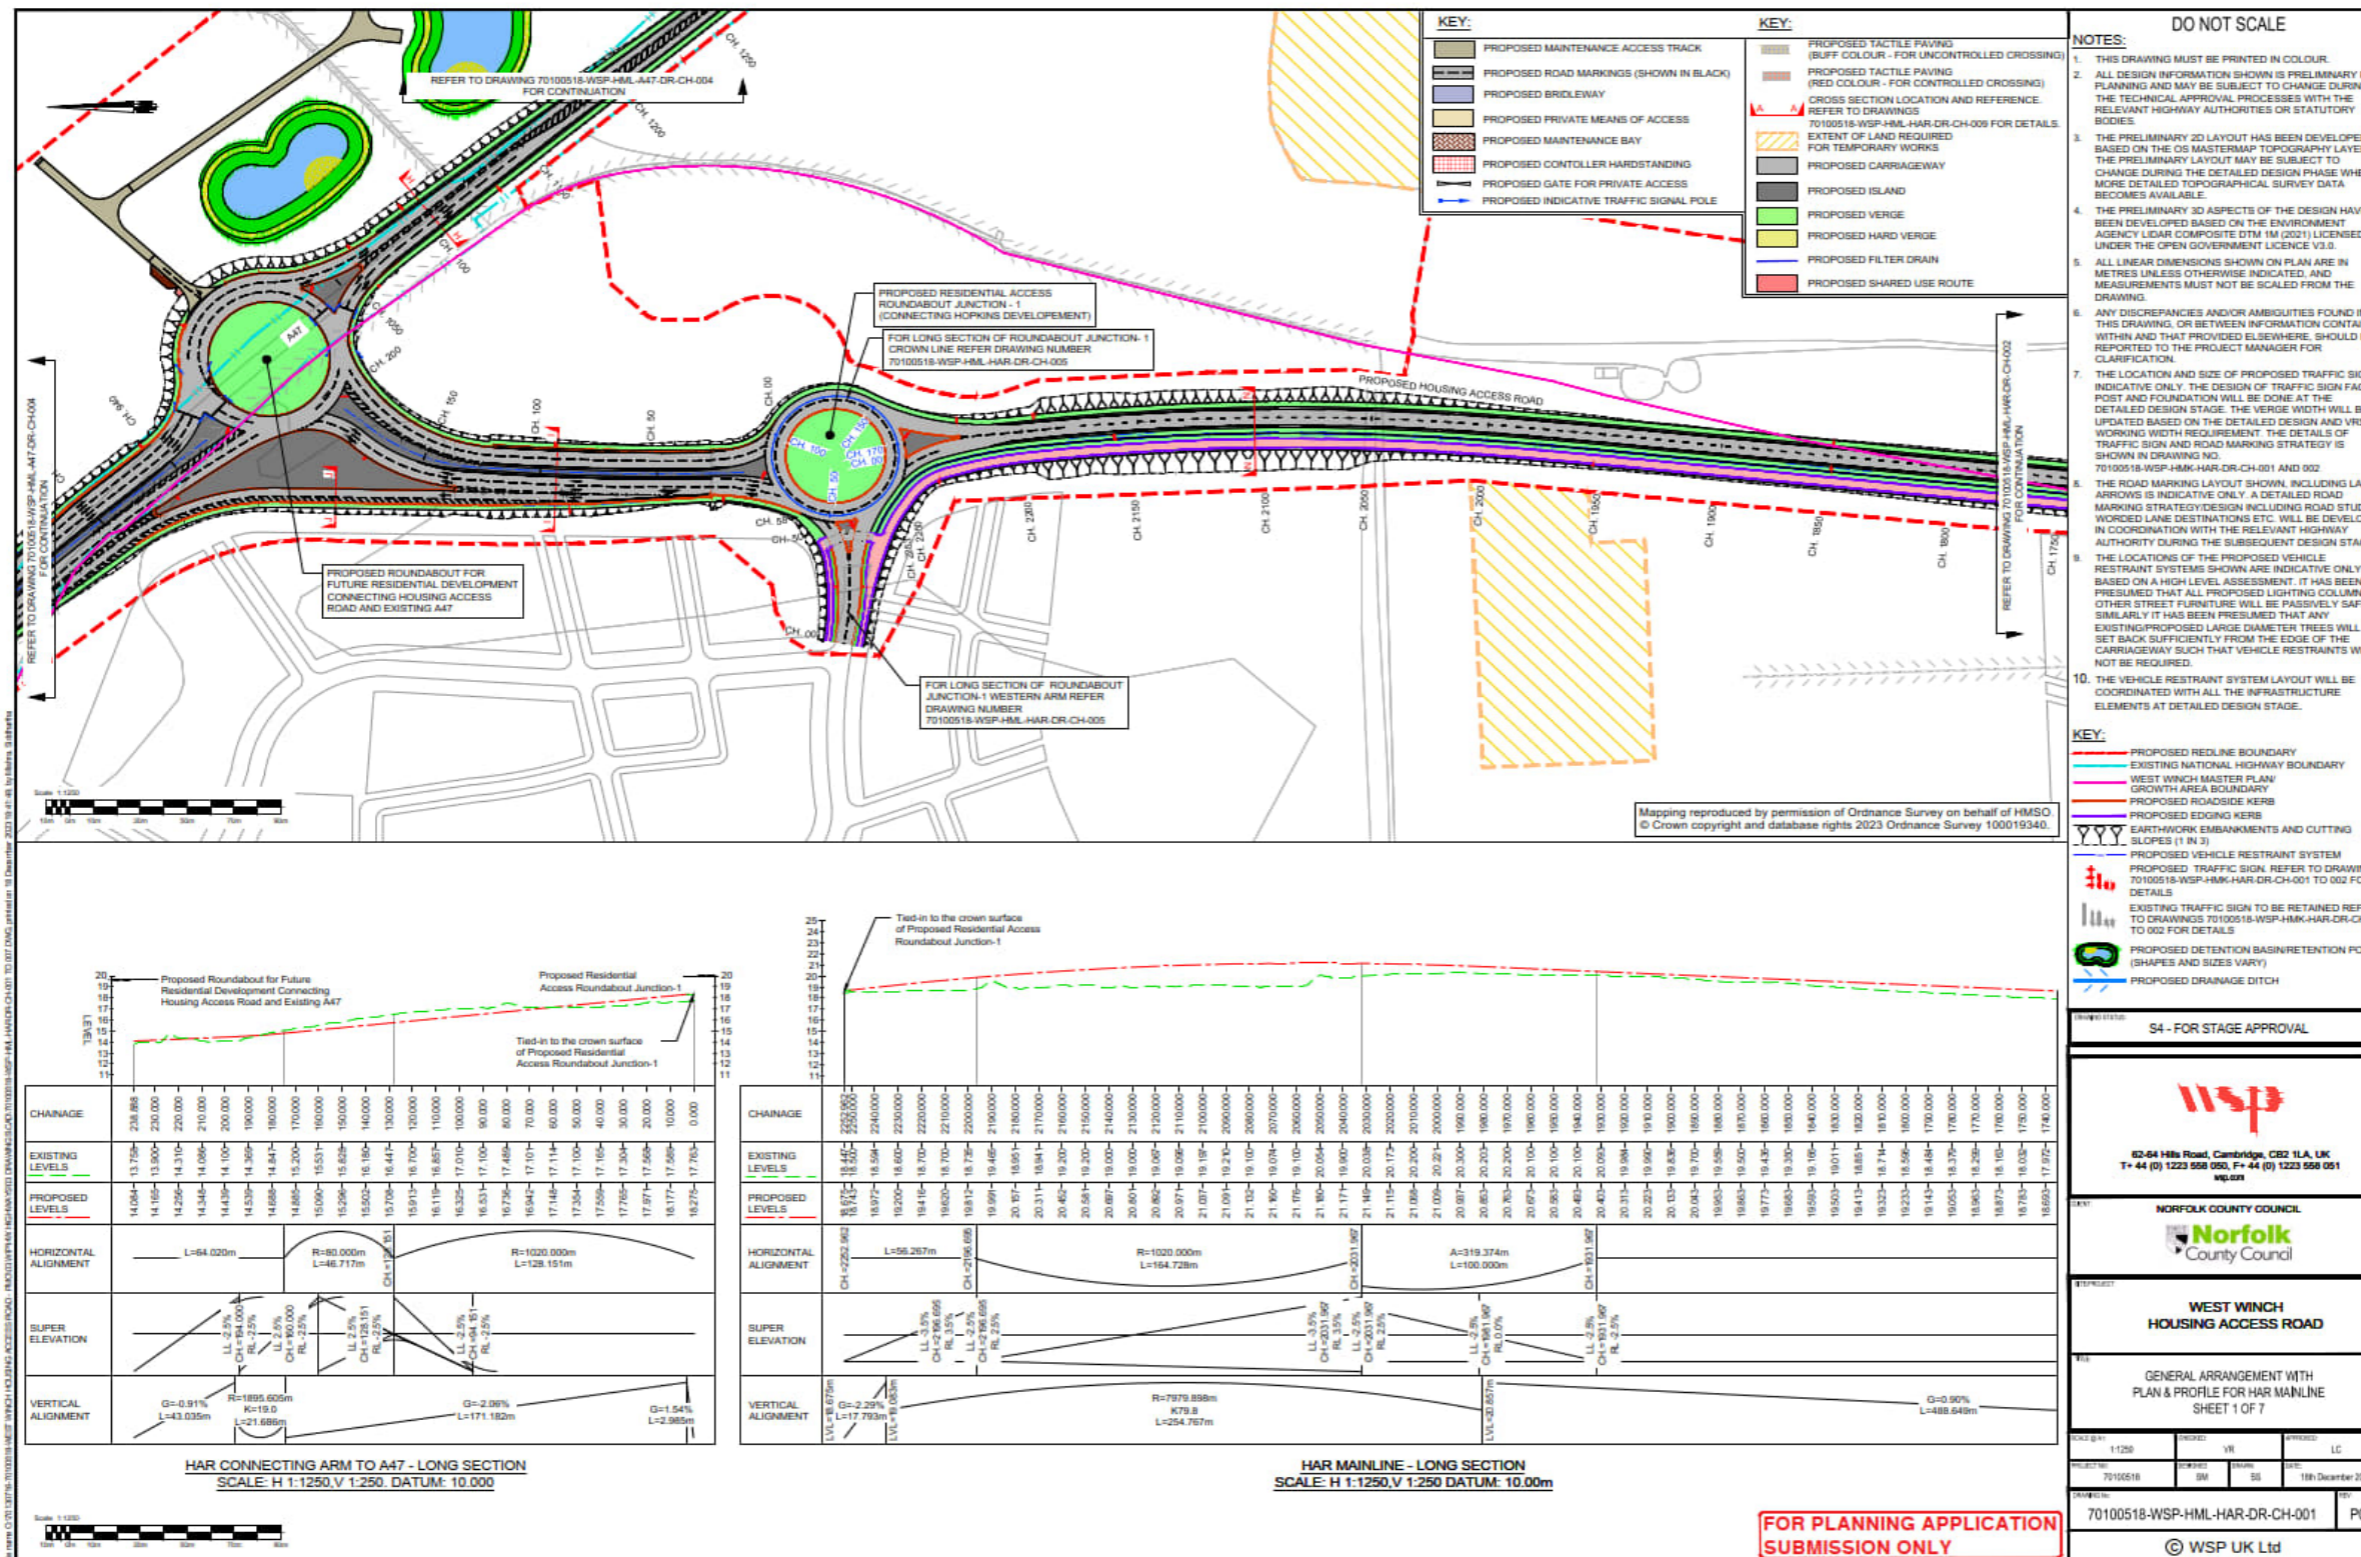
General Arrangement Plan and Profile for HAR (Sheet 2 of 7)
